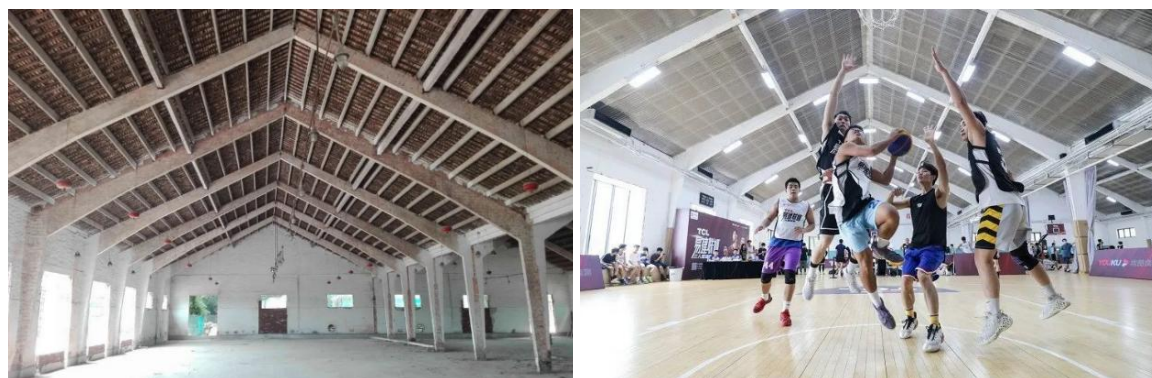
28 Single-layer brick tile roof(left) Transparent waterproof panels(right)
